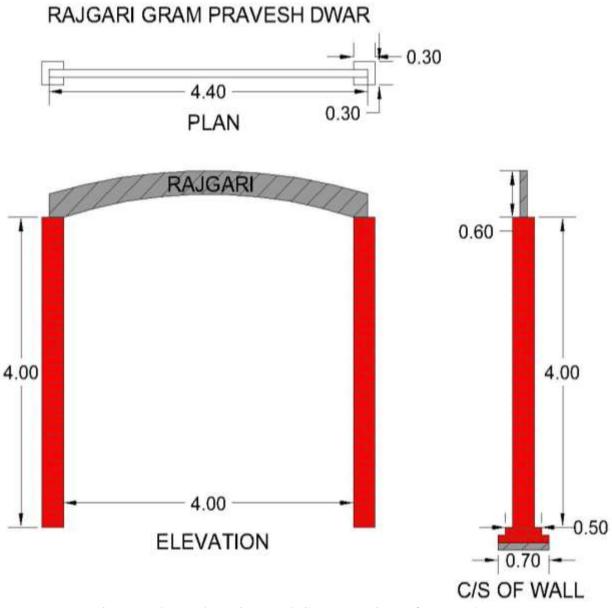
Plan, Elevation and Cross section of Pravesh Dwar
